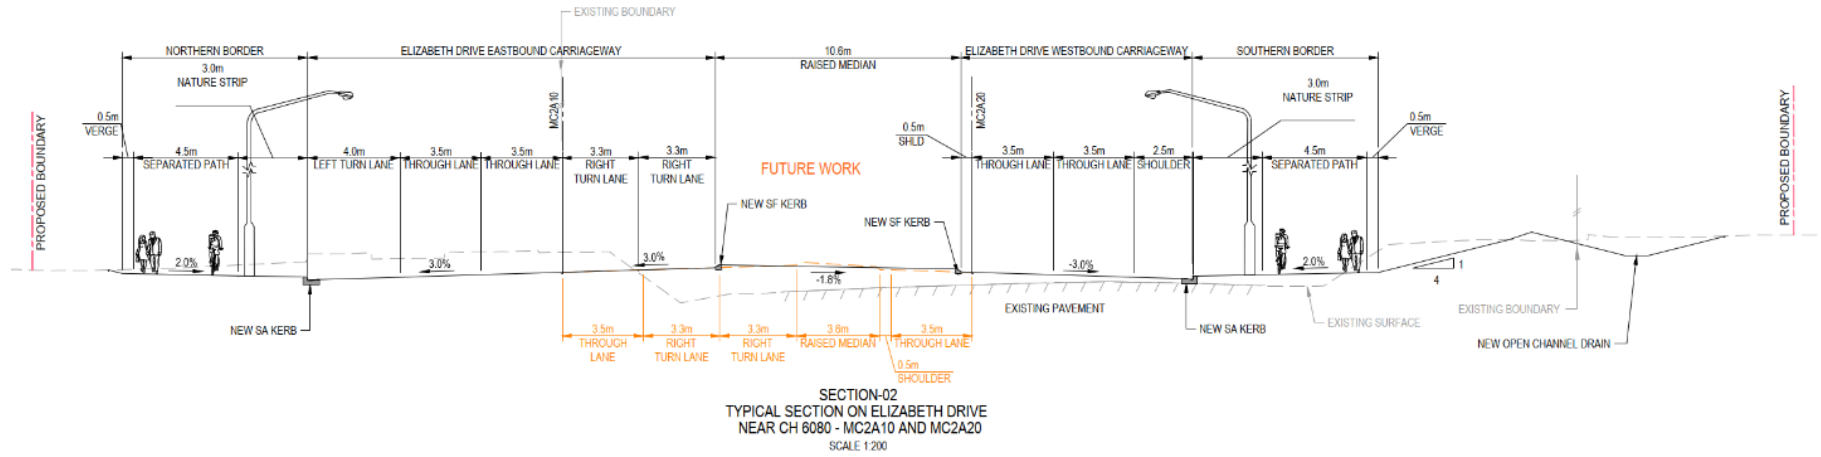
Typical section of proposal on Elizabeth Drive east of Martin Road
